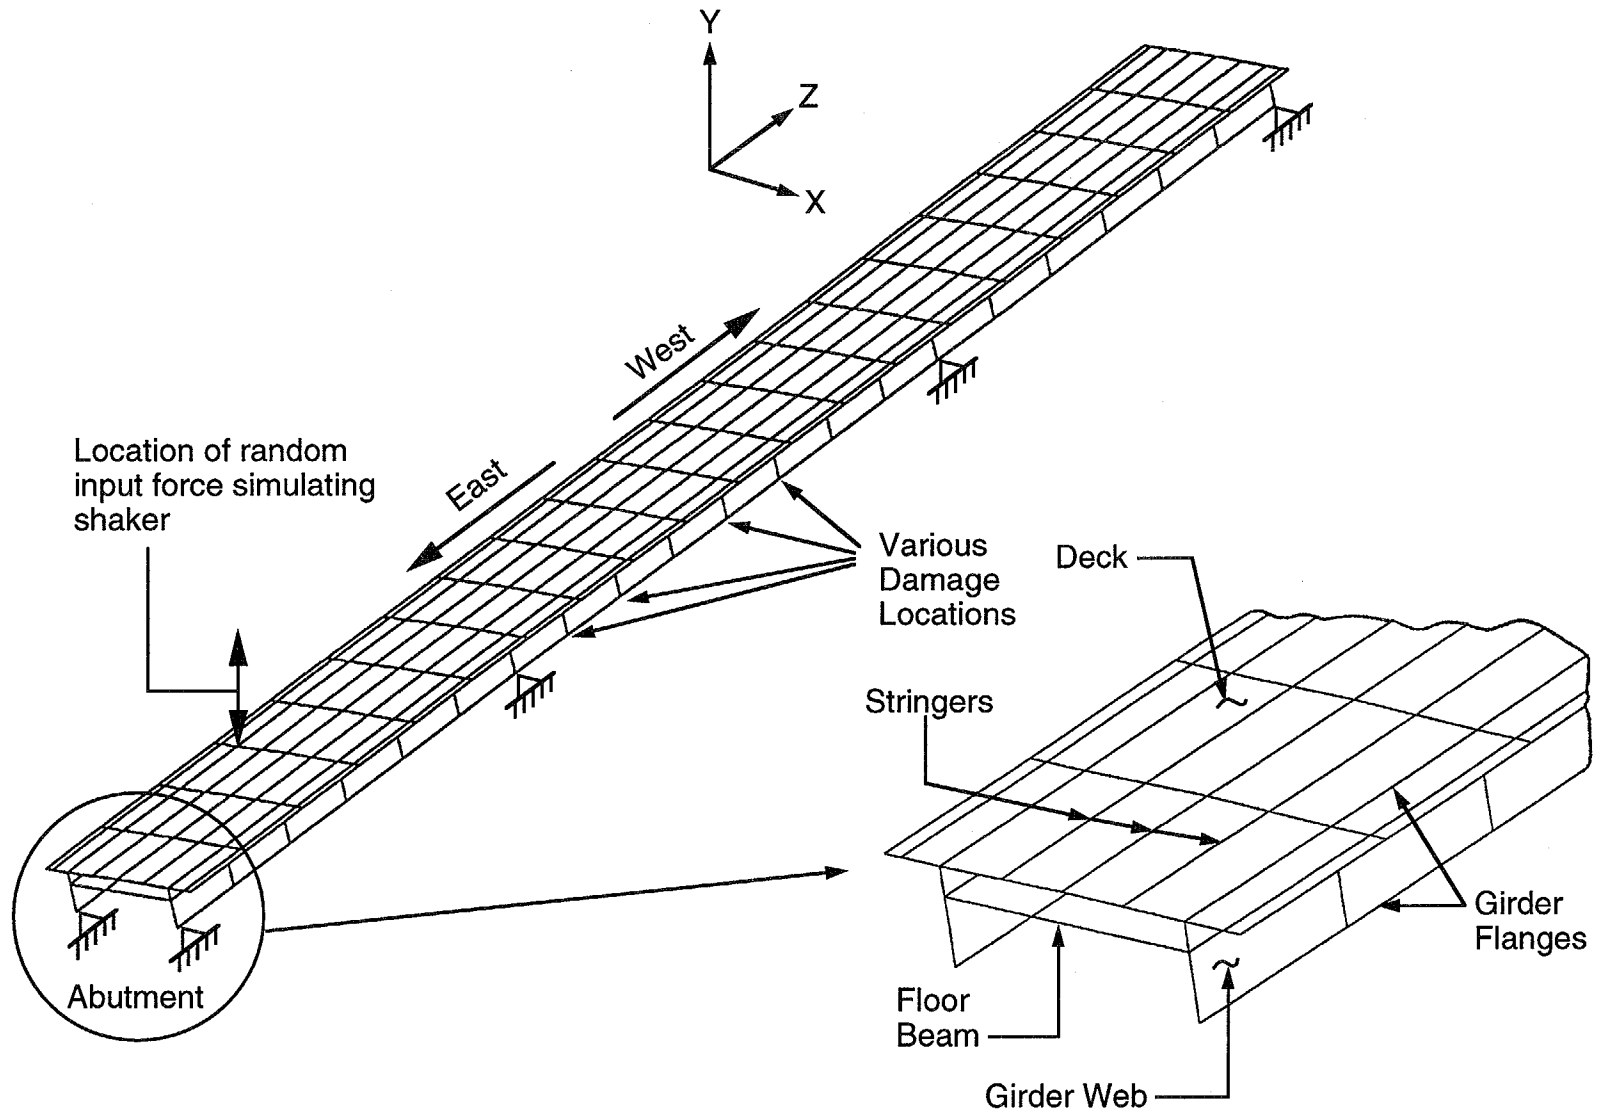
Finite element discretization of the three-span unit of the I-40 Bridge, neglecting the piers.
